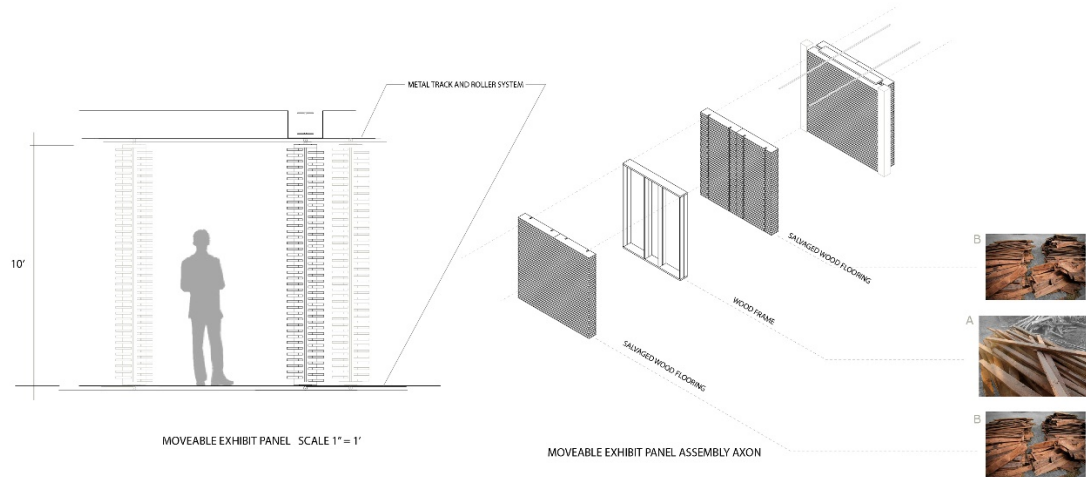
Assembly Detail for moveable wall panels. Source – Author 2014
